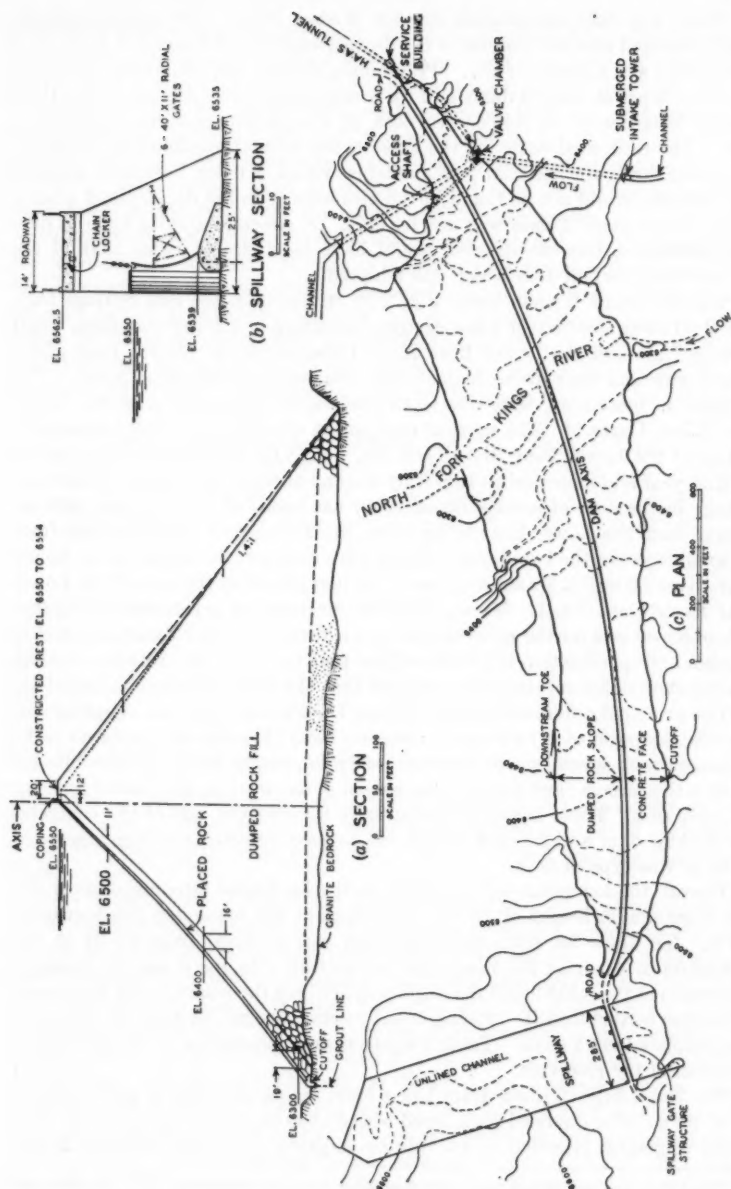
WISHON DAM PLAN, SECTION AND SPILLWAY SECTION
